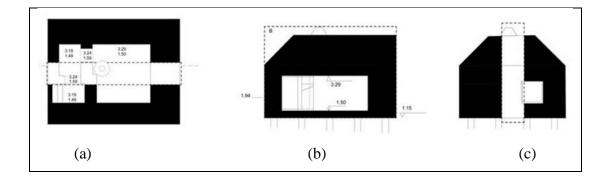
Concept of bunker 599 project, (a) plan showing the slicing up and interior openings, (b) section showing the openings, (c) section showing the openings and wooden
